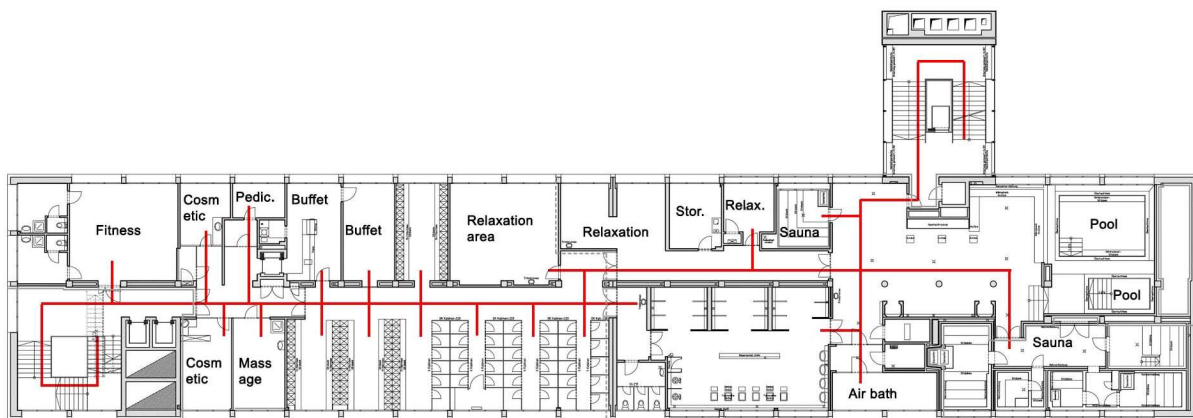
3<sup>rd</sup> floor plan Floridsdorfer swimming hall 1:500 (source: MA 44, 2016/17)
